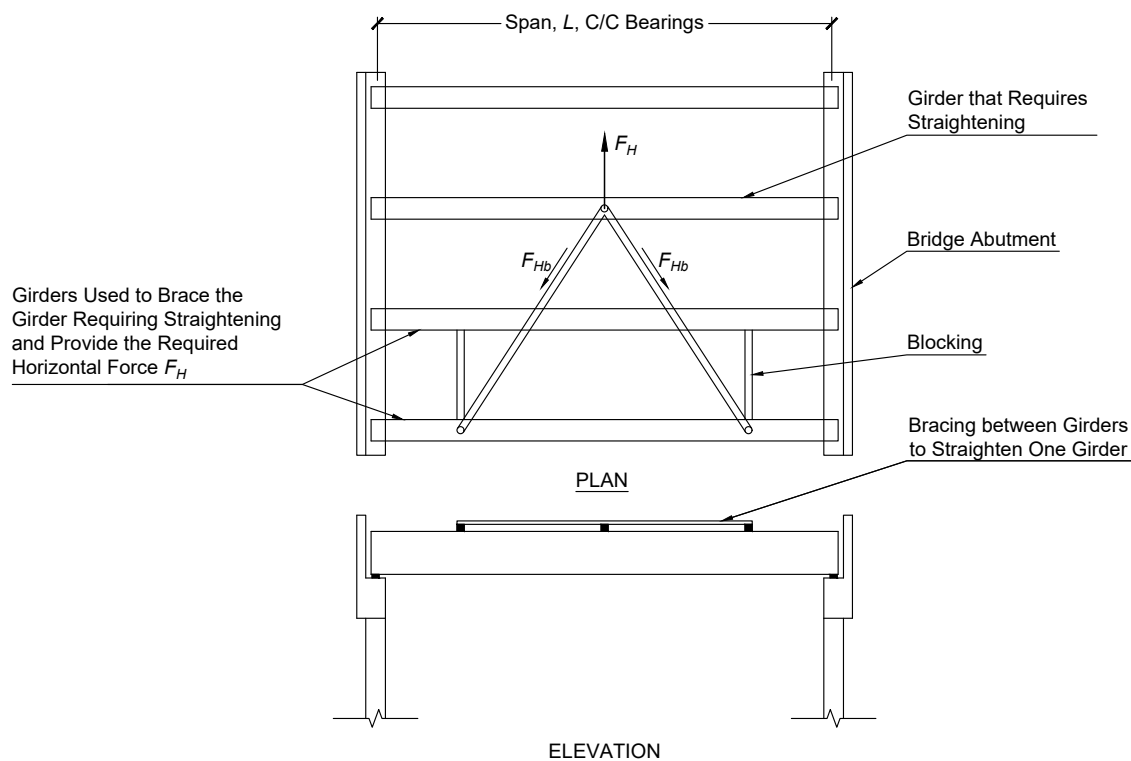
Schematic for possible scheme to straighten one girder in a four-girder span. Lateral girder bracing is required for stability at supports. Note: For illustration purposes girder spacing is exaggerated with respect to the girder span.
